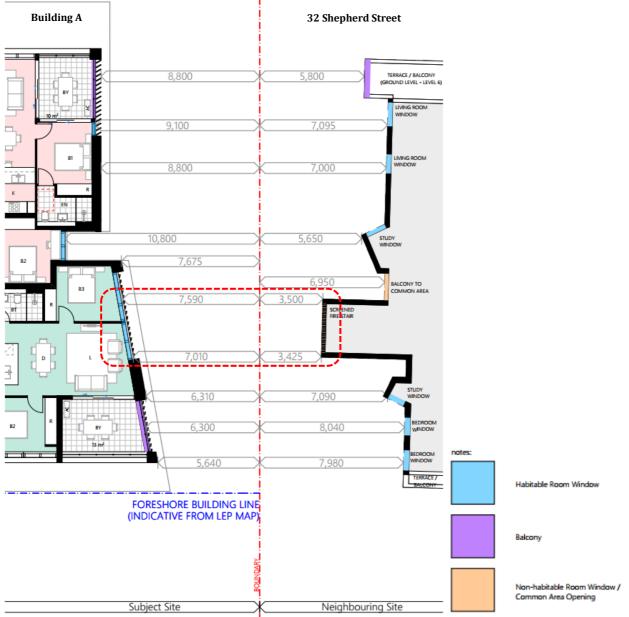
Proposed building separation with 32 Shepherd Street – Levels 7-10
